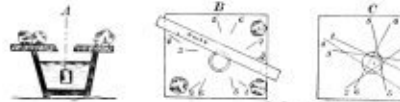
TUB FOR SHAFT PLUMBING. A, ELEVATION; B, PLAN OF TOP; C, FINDING THE POINT.
